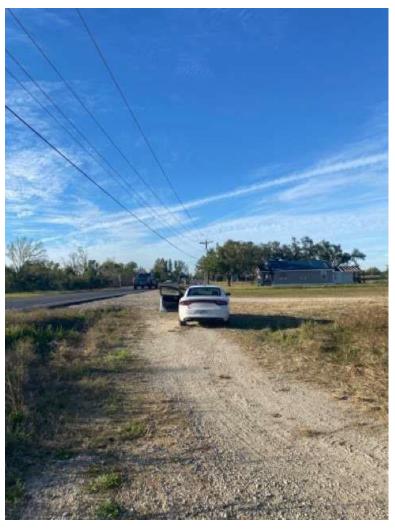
Photograph of Existing Site Conditions at the Proposed Chiasson LF-3 Group Site Facing North
